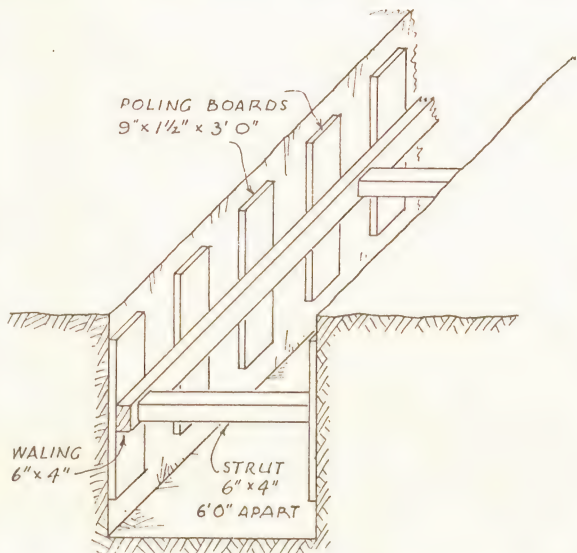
Poling boards and struts in shallow trench in moderately firm ground.
